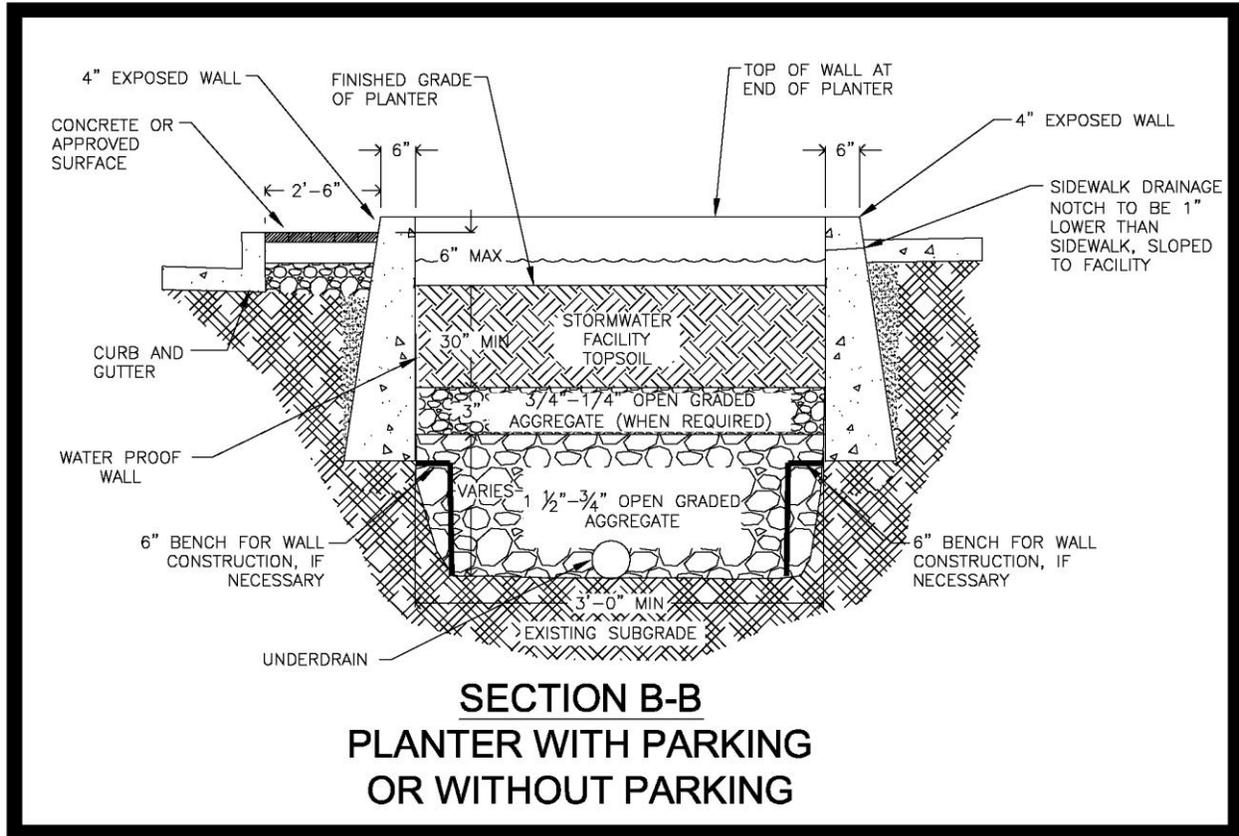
Green Streets Planter Section View With or Without Parking (source: Portland, 2011)
